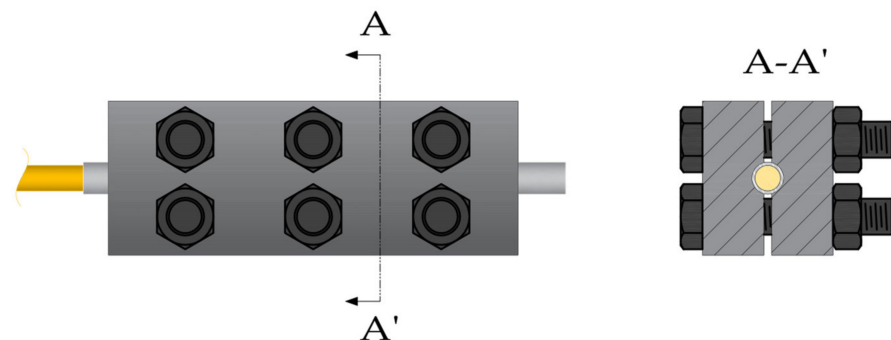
Example of a clamping anchorage composed of two steel plates joined by steel bolts.
